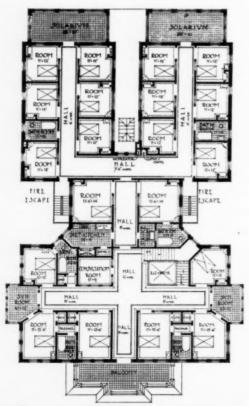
Baker Sanatorium, Charleston, S. C. Second floor plan.
